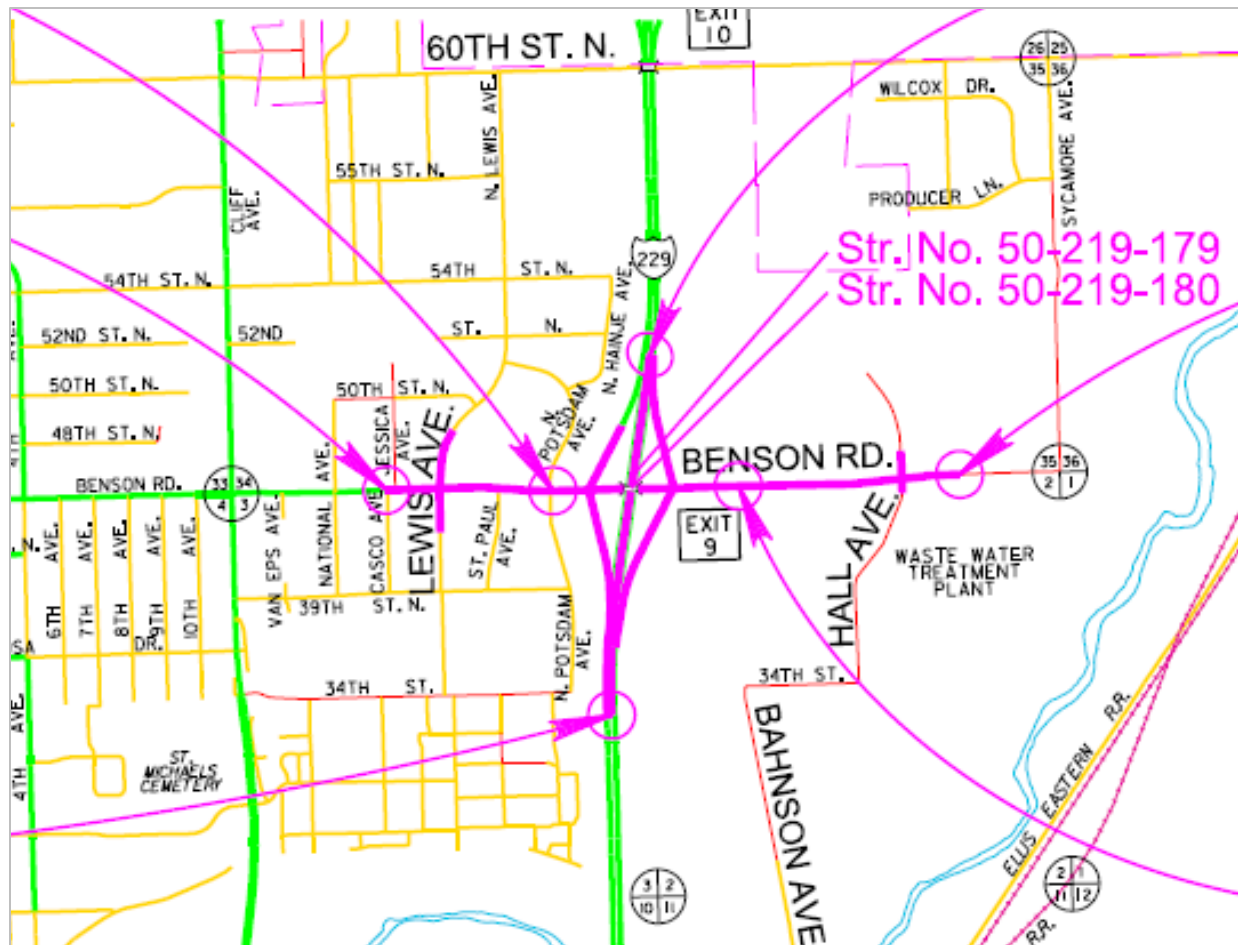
IM 2292 (98)9 project plan at Benson Road
